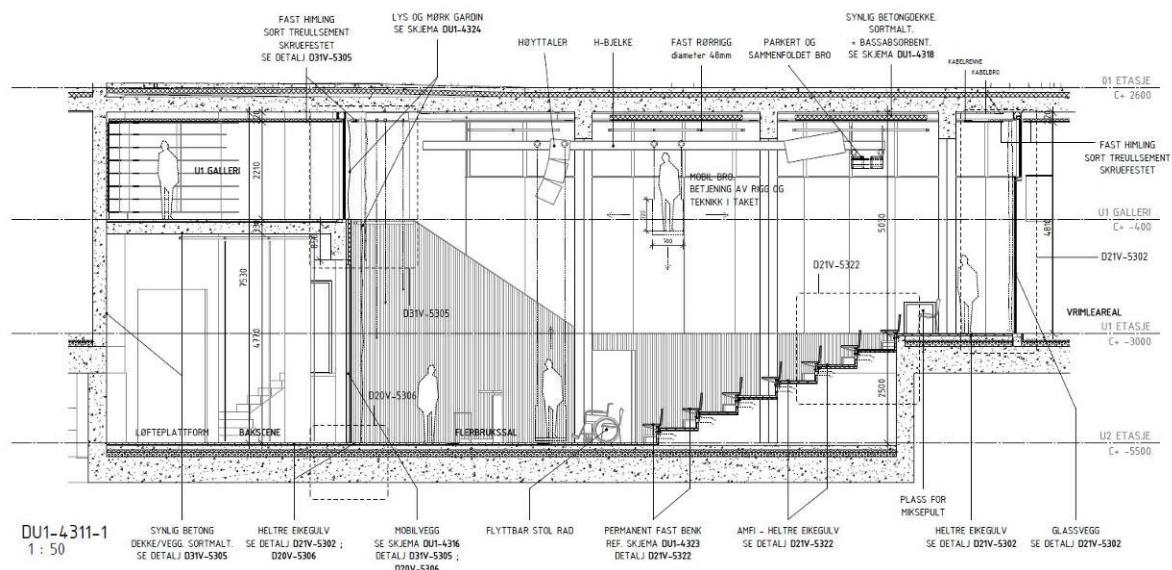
Sectional drawing of the hall in the new library (Courtesy of Lund Hagem architects)
